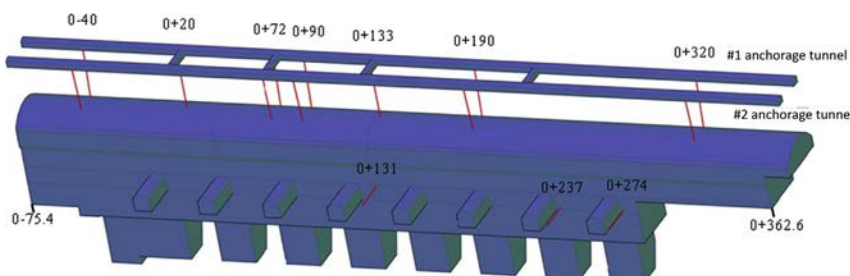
Observational boreholes on the roof and sidewalls of powerhouse.
